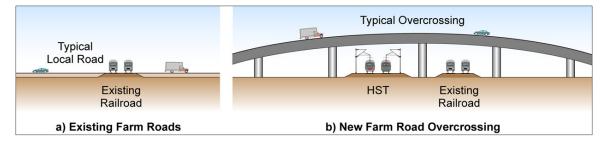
Replacing local at-grade crossings with new overcrossings above HSR guideway and existing railroad trackway
